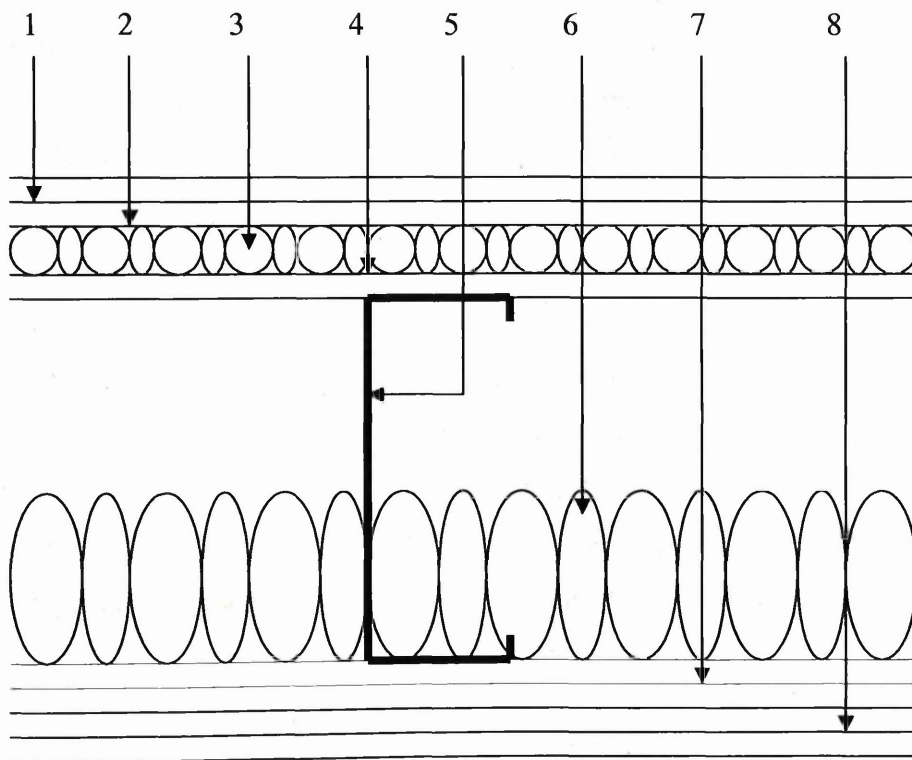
Typical characteristics of a light steel floor. (The Steel Construction Institute, 1998)
